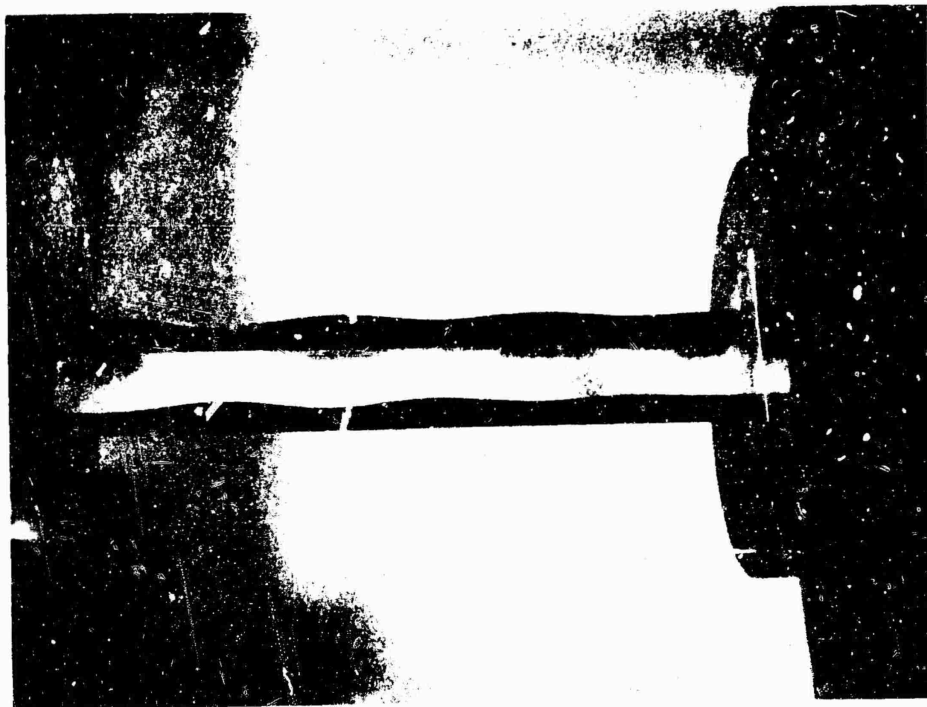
(c) -- Local Buckling of U-Shaped Strut.
